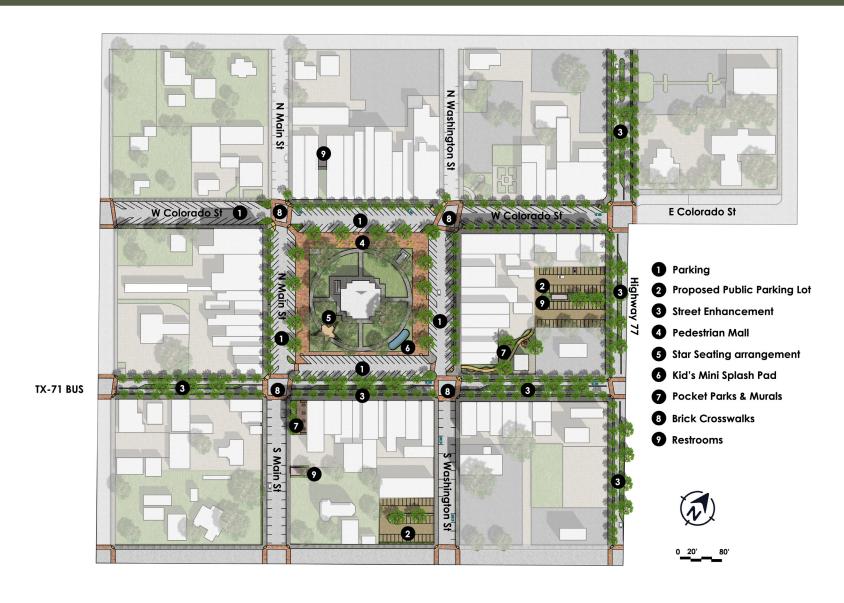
Proposed Master Plan of Downtown La Grange, Texas
